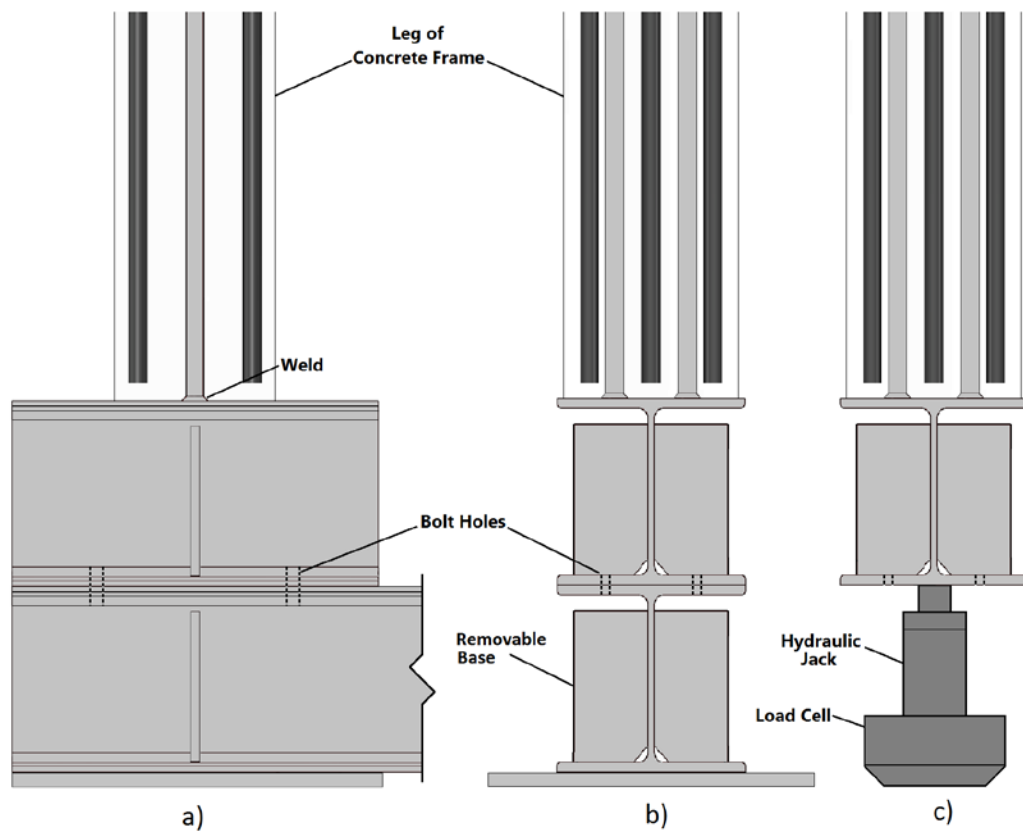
Connection Detailing at Base of Concrete Frame: a) Front View; b) Side View During Lateral Sway Test; c) Side View During Vertical Racking Test
